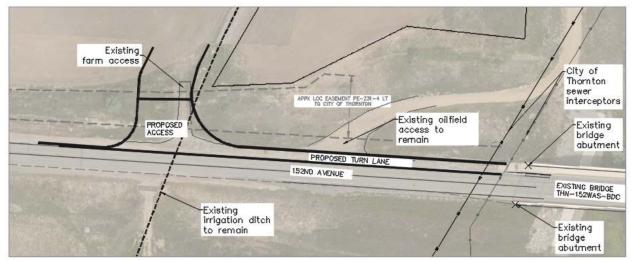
Conceptual sketch of proposed access. All proposed information is conceptual and subject to change.
